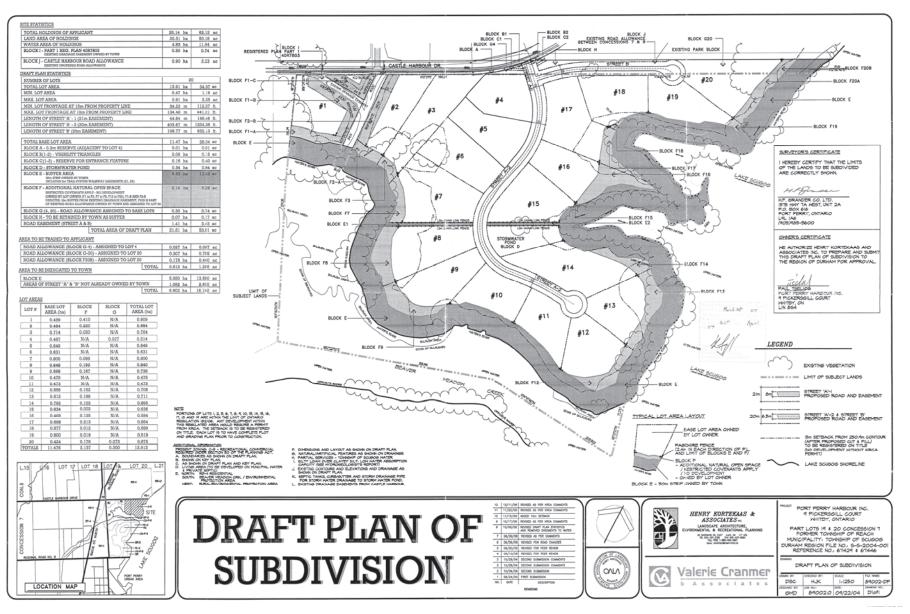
Existing Draft Approved Plan of Subdivision (S-S-2004-01)
